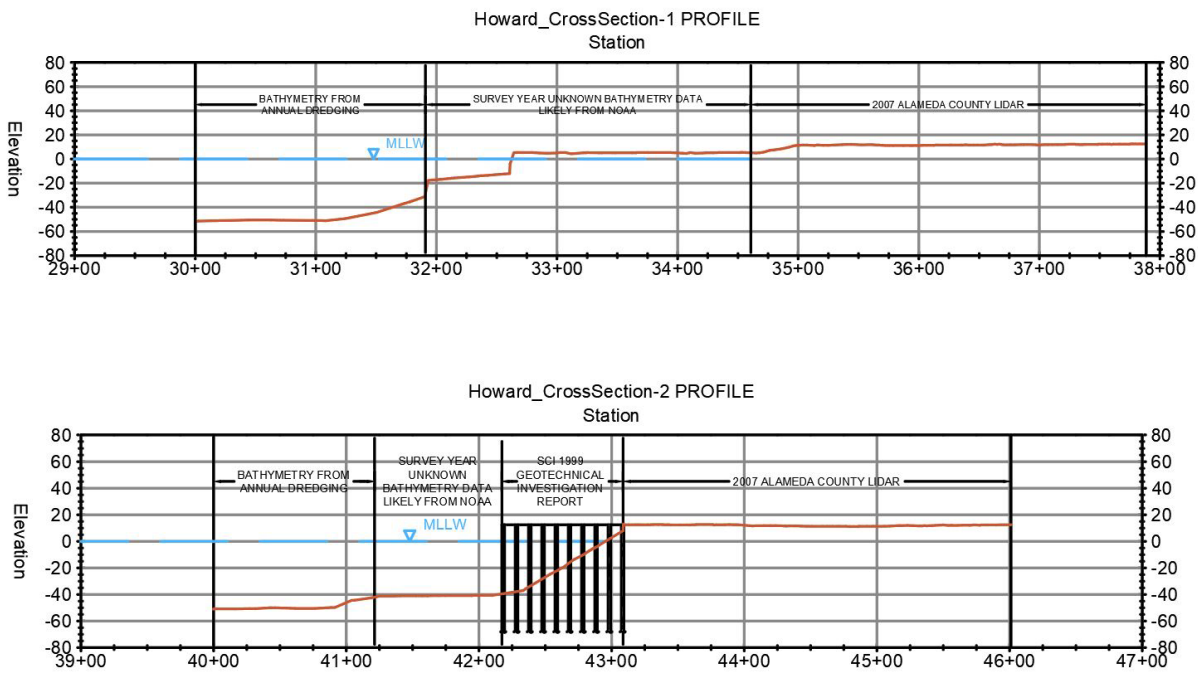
Howard Terminal Cross Sections of the Existing Grade
